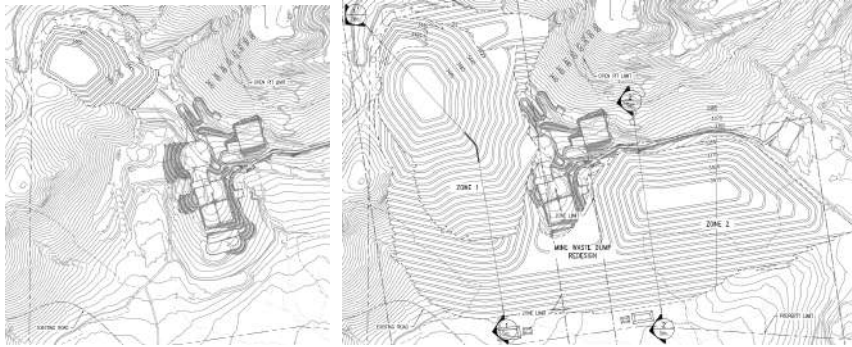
Original design (left) and proposed layout (right) of the mine waste dump.
